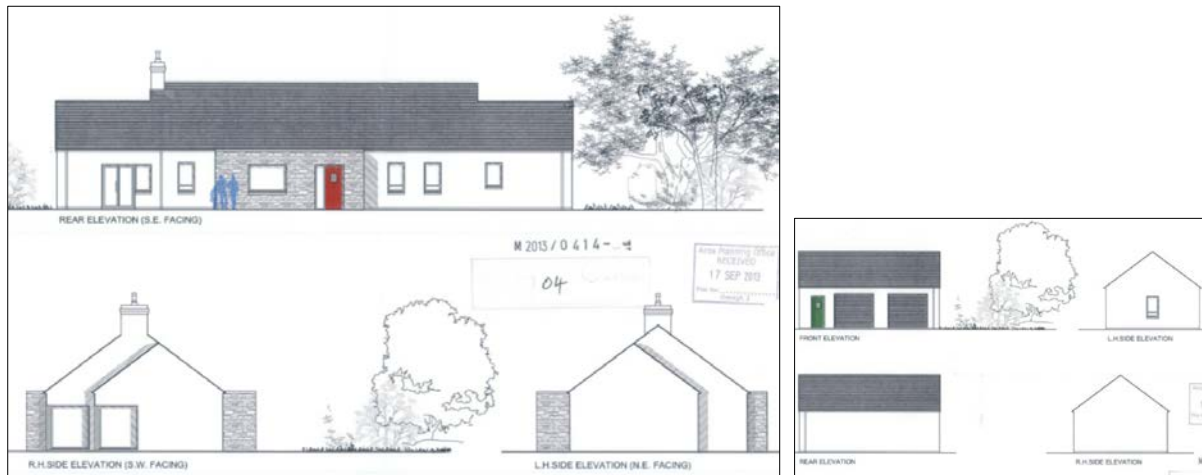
Elevations of dwelling and garage approved under M/2013/0414/F
